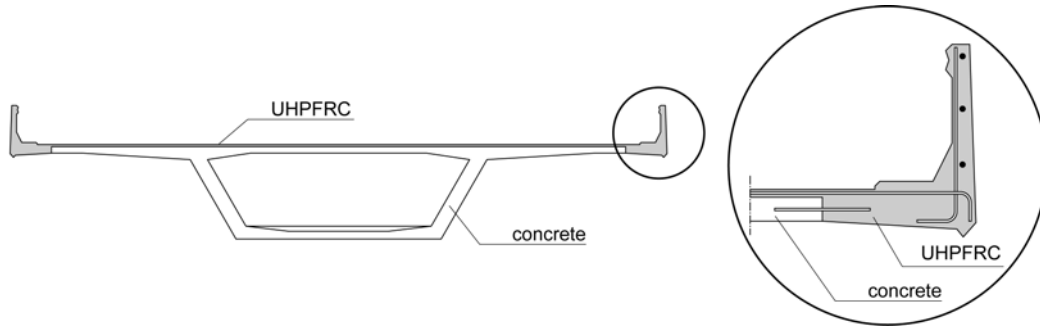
Composite “UHPFRC-concrete” bridge deck
